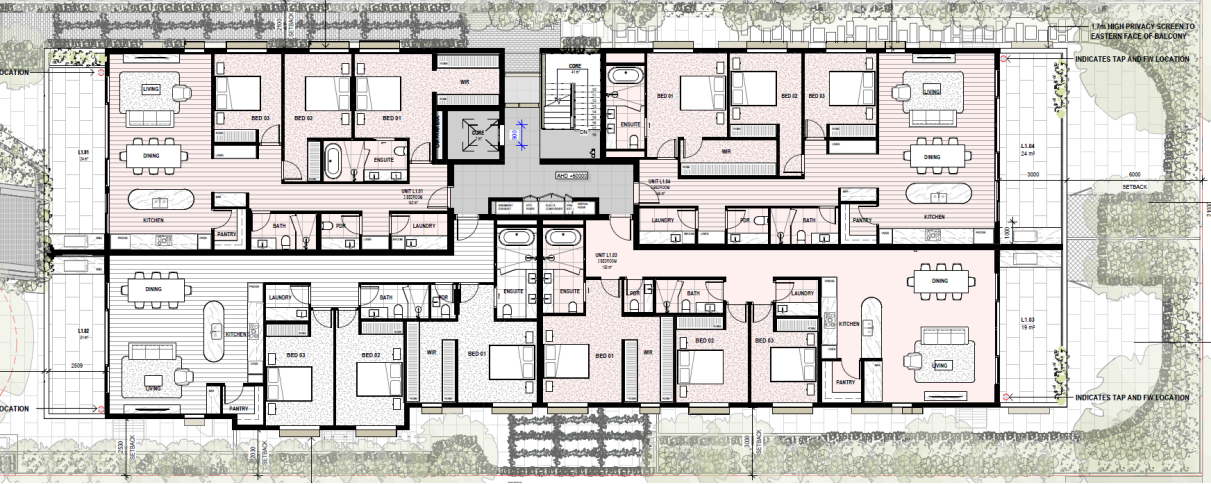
Level 1 Plan (Previous (VCAT PNPE9) Design)
